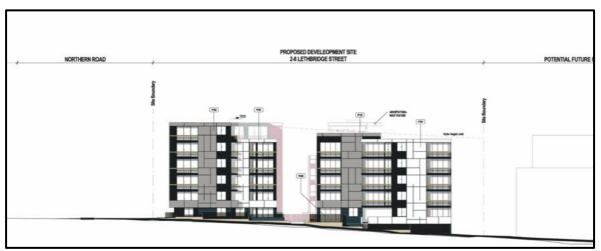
Approved 2 x 6 storey residential flat building at nos. 2 – 8 Lethbridge Street
